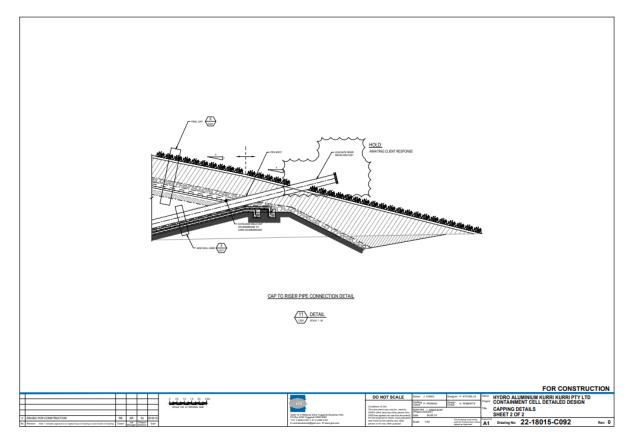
Elevation View of Riser Pipes Protruding Through the Cap (GHD, 2018).
